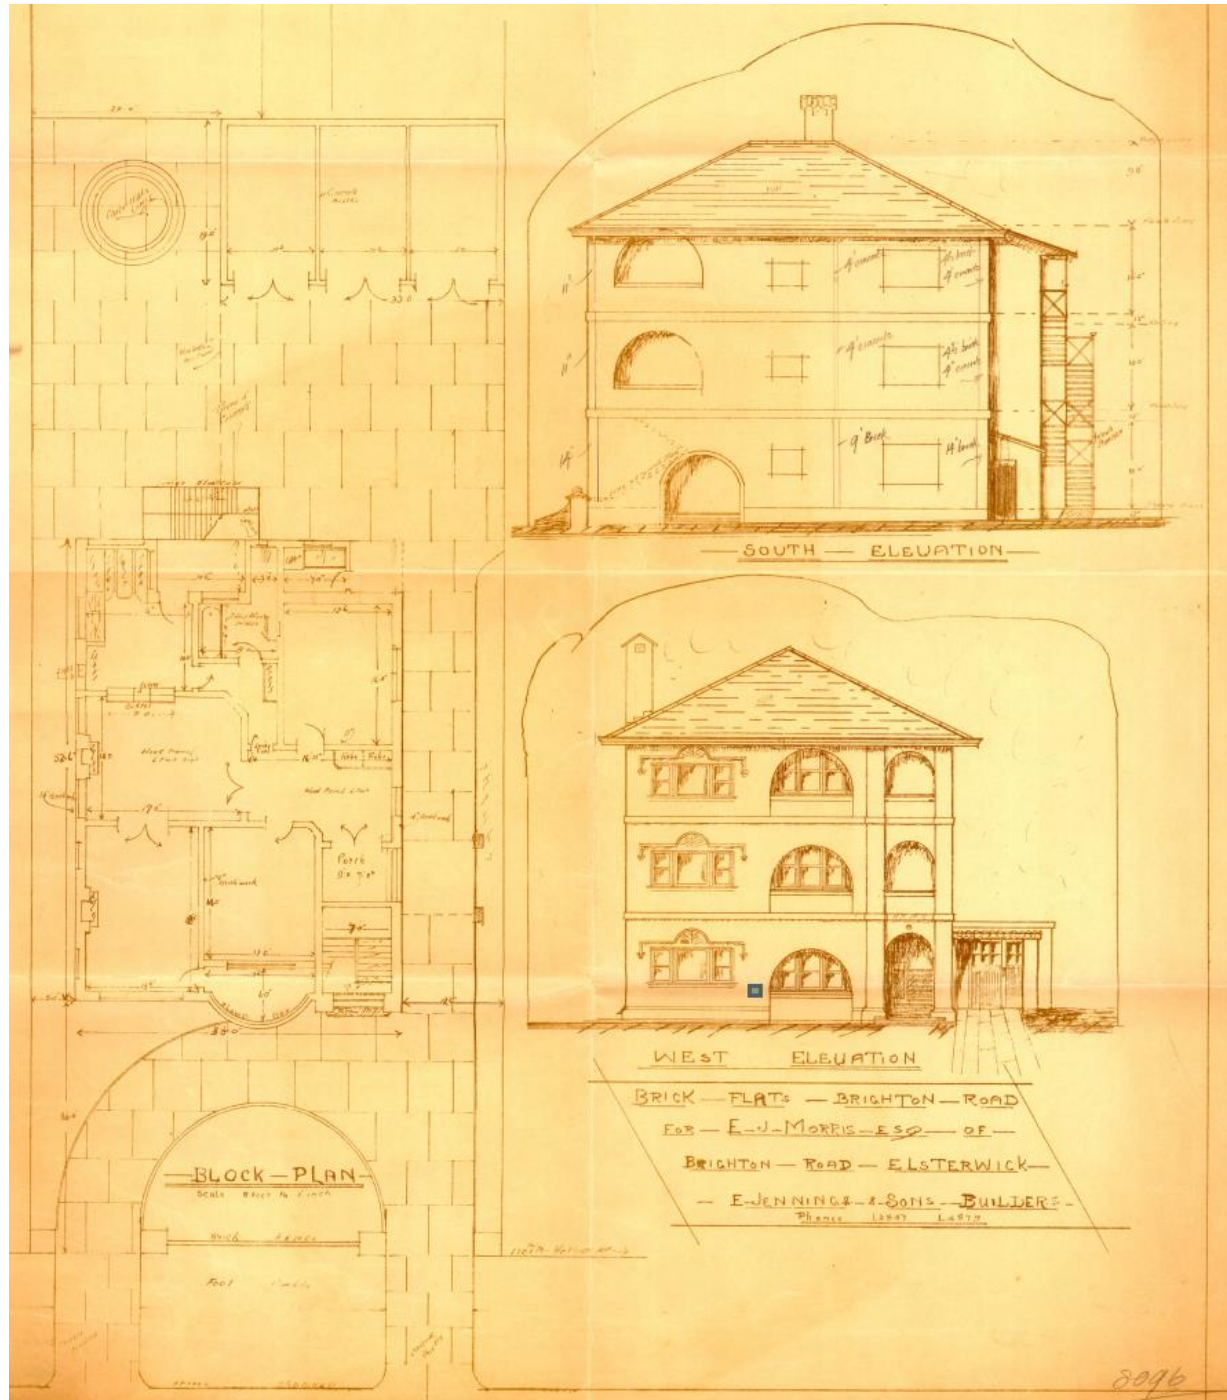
1932 building permit plans and elevations for the flats at 122 Brighton Road. Note the curved front drive and garages at the rear. (Source: St Kilda Council Building Permit no. 8096, 27 July 1932)
